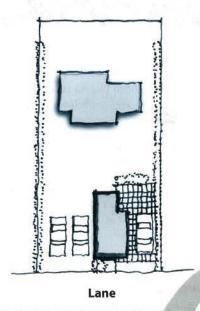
Dedicated coach house parking seperate from parking for principal dwelling
